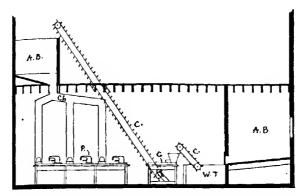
Fig. VIII.—Sectional View of Evaporator from Side, showing Belt Conveyor from Grader to Storage Bin and Chutes from Bin to Paring Table.
